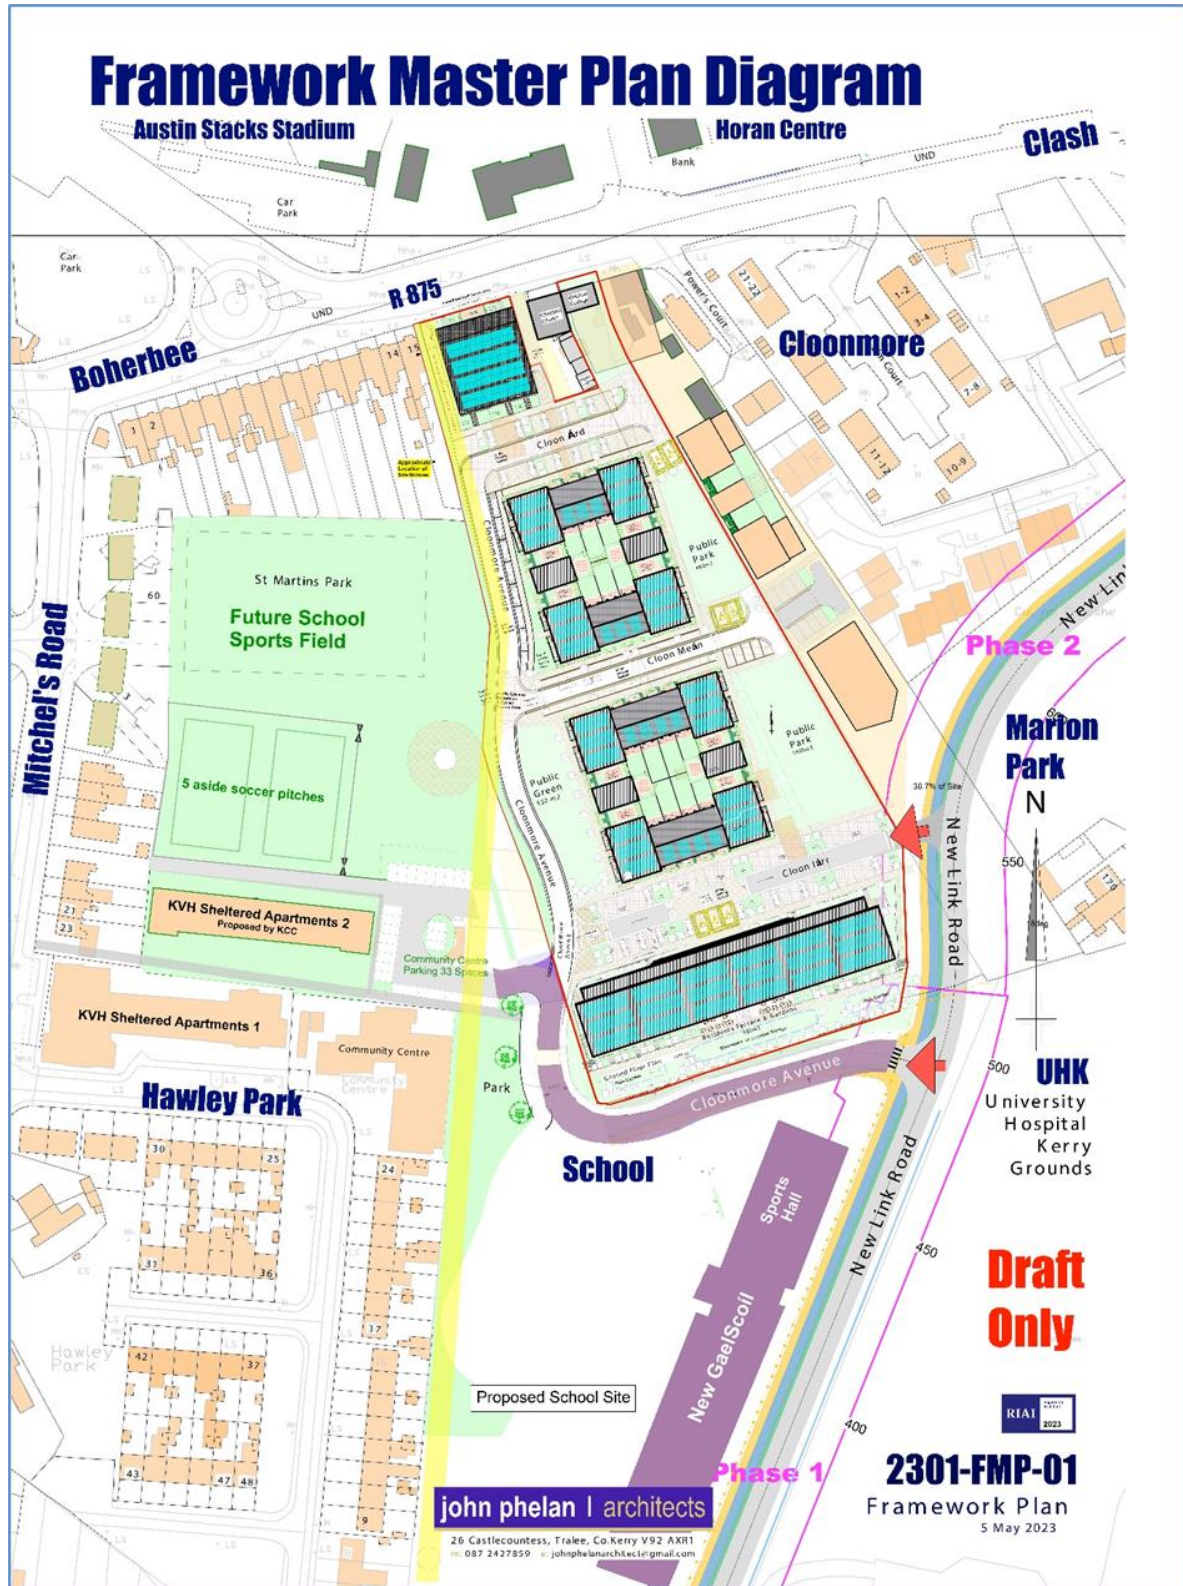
PDS layout plan (courtesy of John Phelan Architects).
